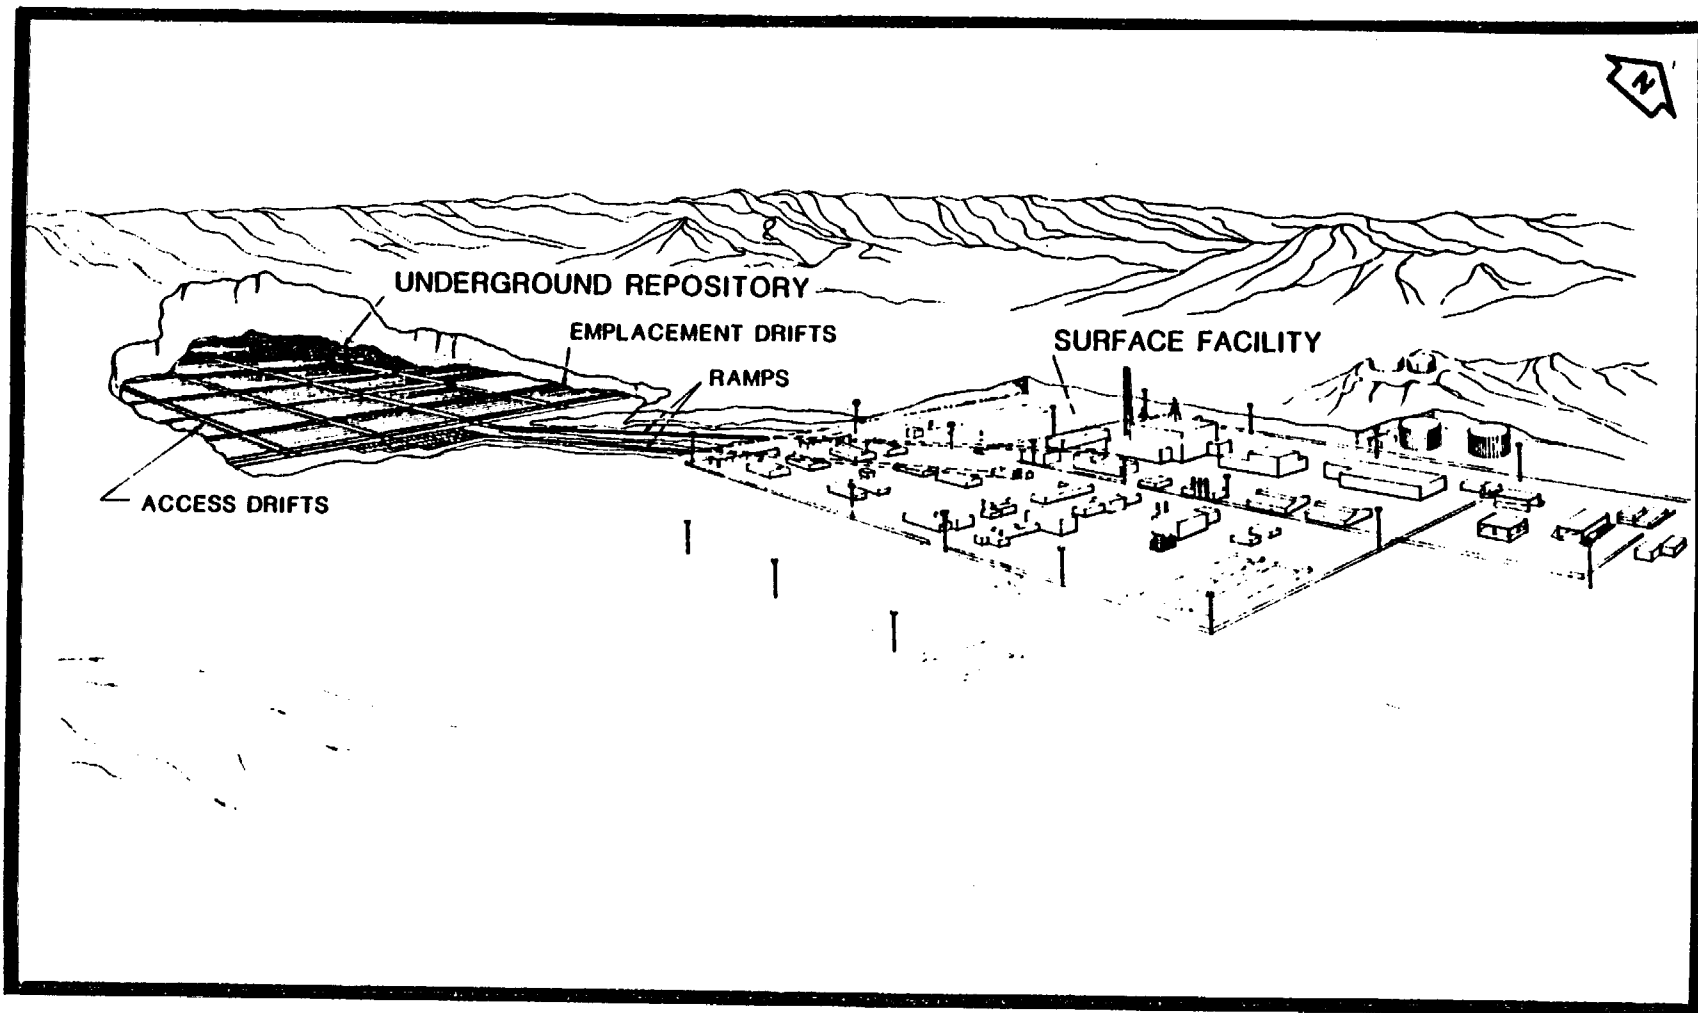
Artist's rendition of the proposed Yucca Mountain repository.
